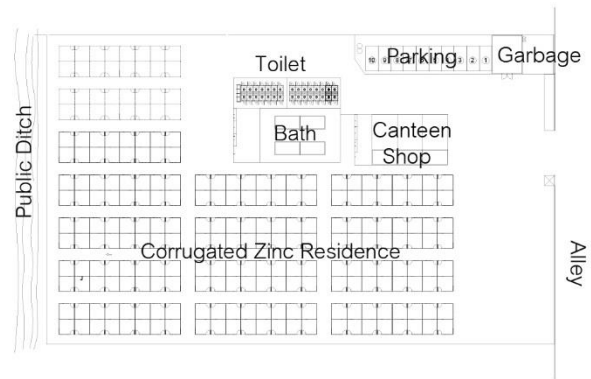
Univance New Factory Campsite, Thai Kajima, 2015
